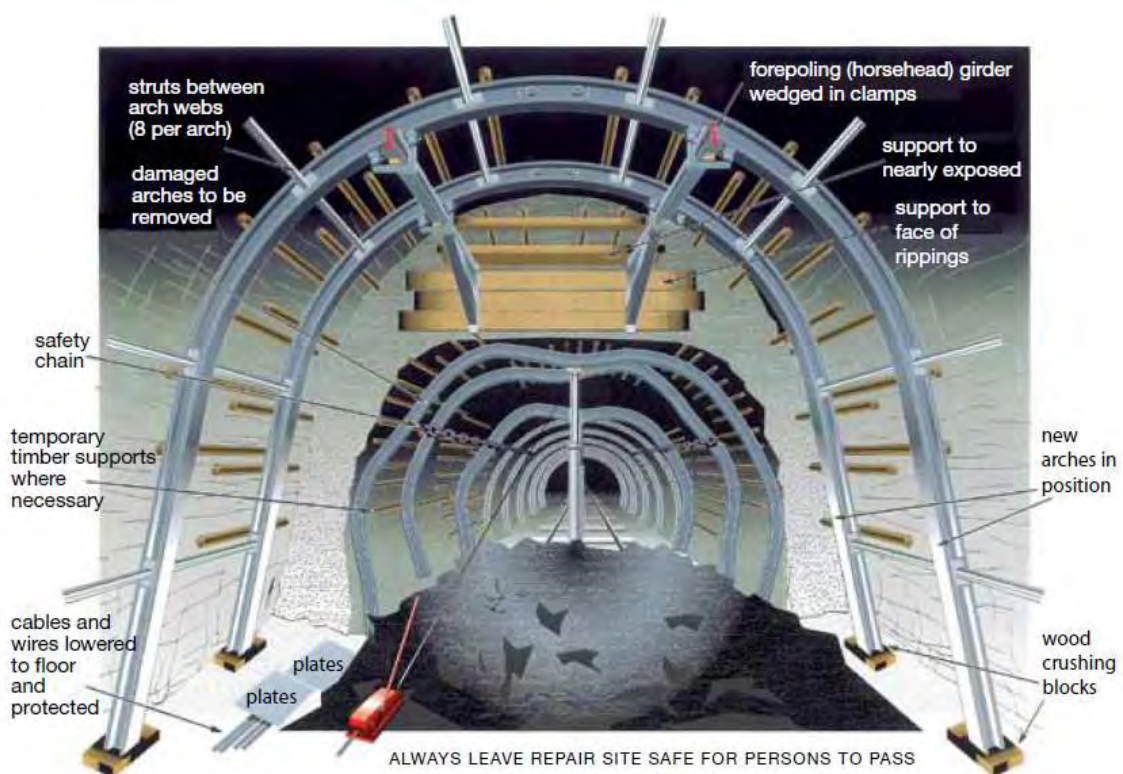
Typical Layout of a Back Ripping in Arch Roadway¹
